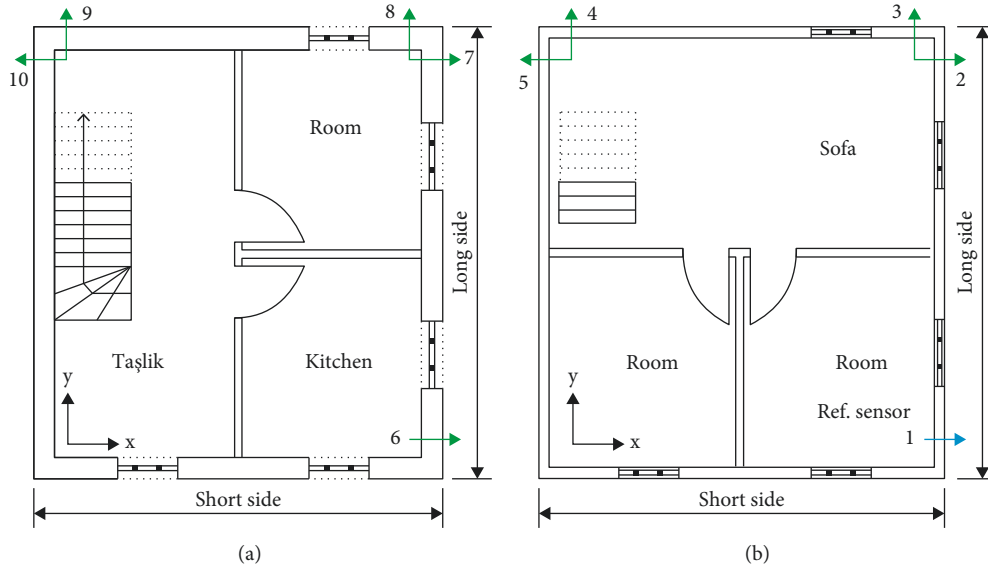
The sensor placements of the houses on plan views: (a) ground floor; (b) upper floor.
